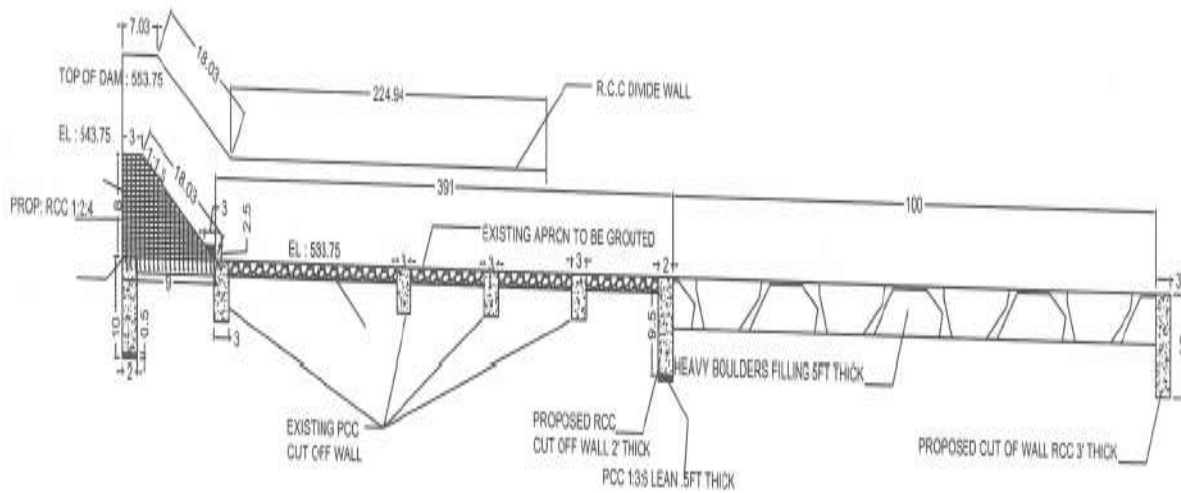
Typical X-Section of Spillway Brewery Delay Action Dam
